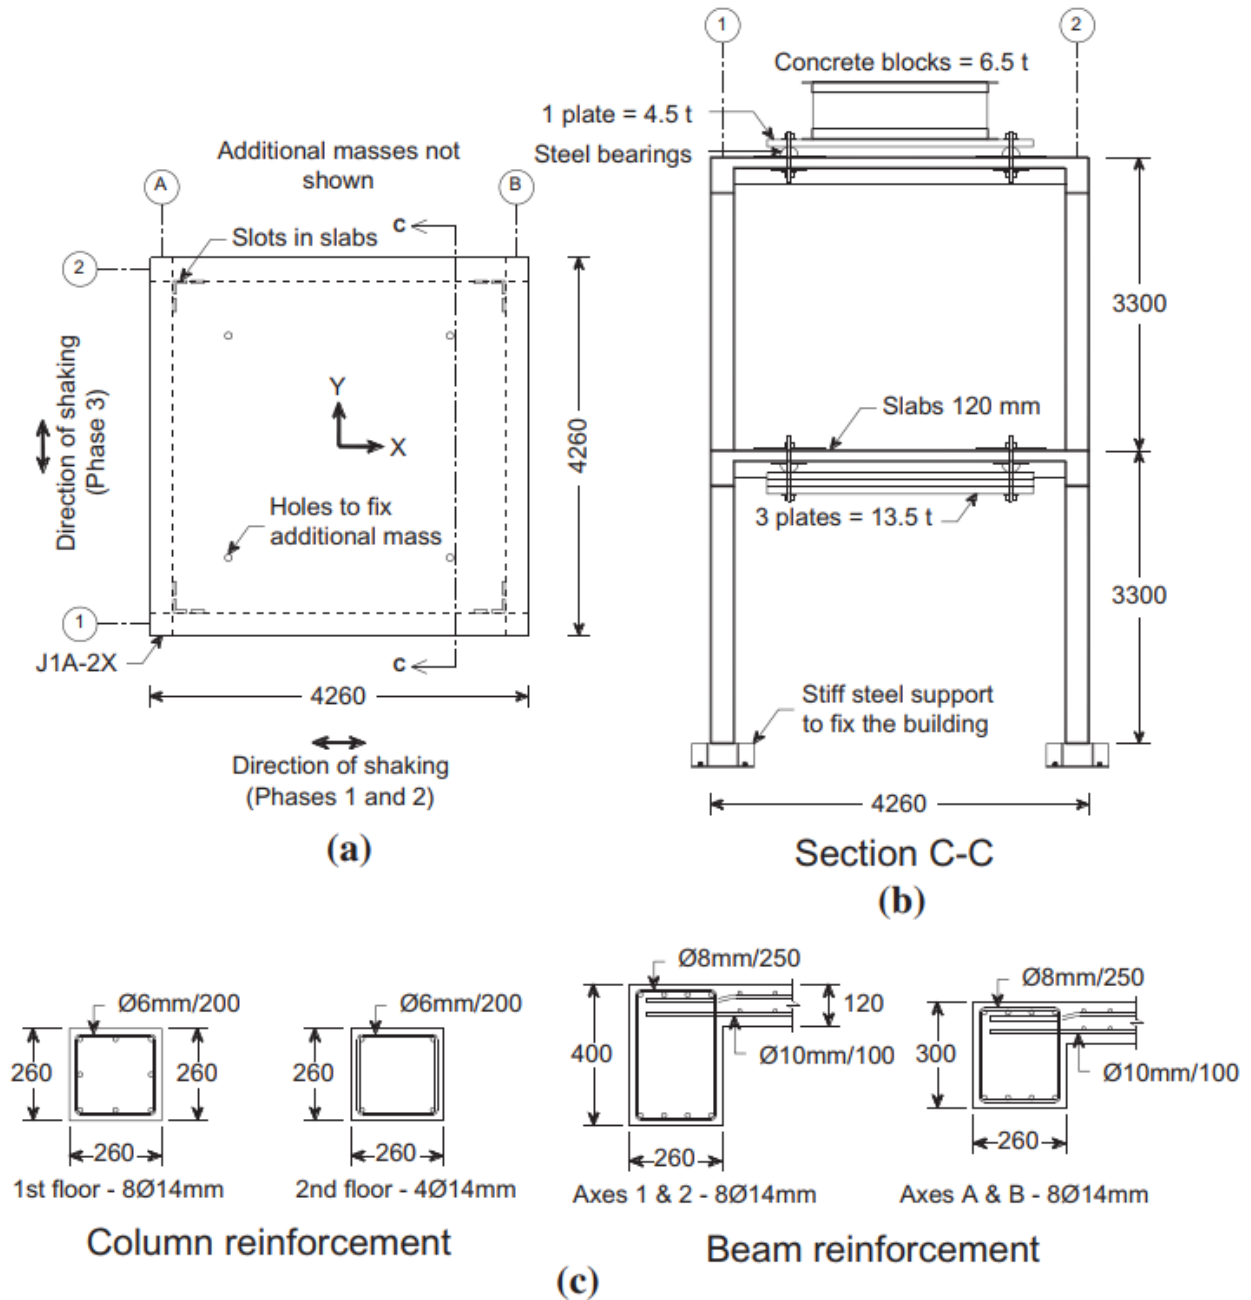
a) plan b) elevation and c) detailing of the beam and column sections for the 1st and 2nd storeys of Bandit frame (Garcia et al., 2014).
